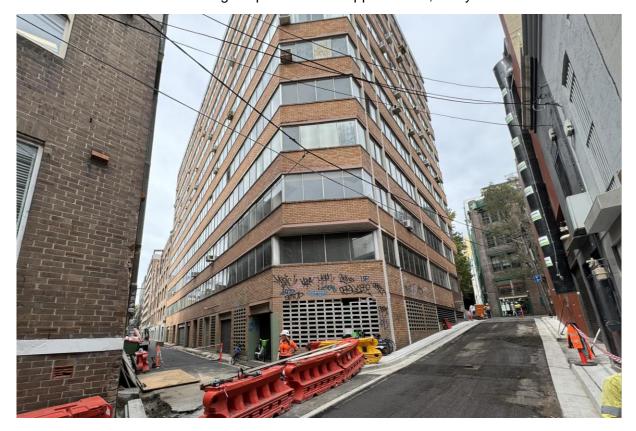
Corner of Sophia Street and Terry Street looking towards the site
